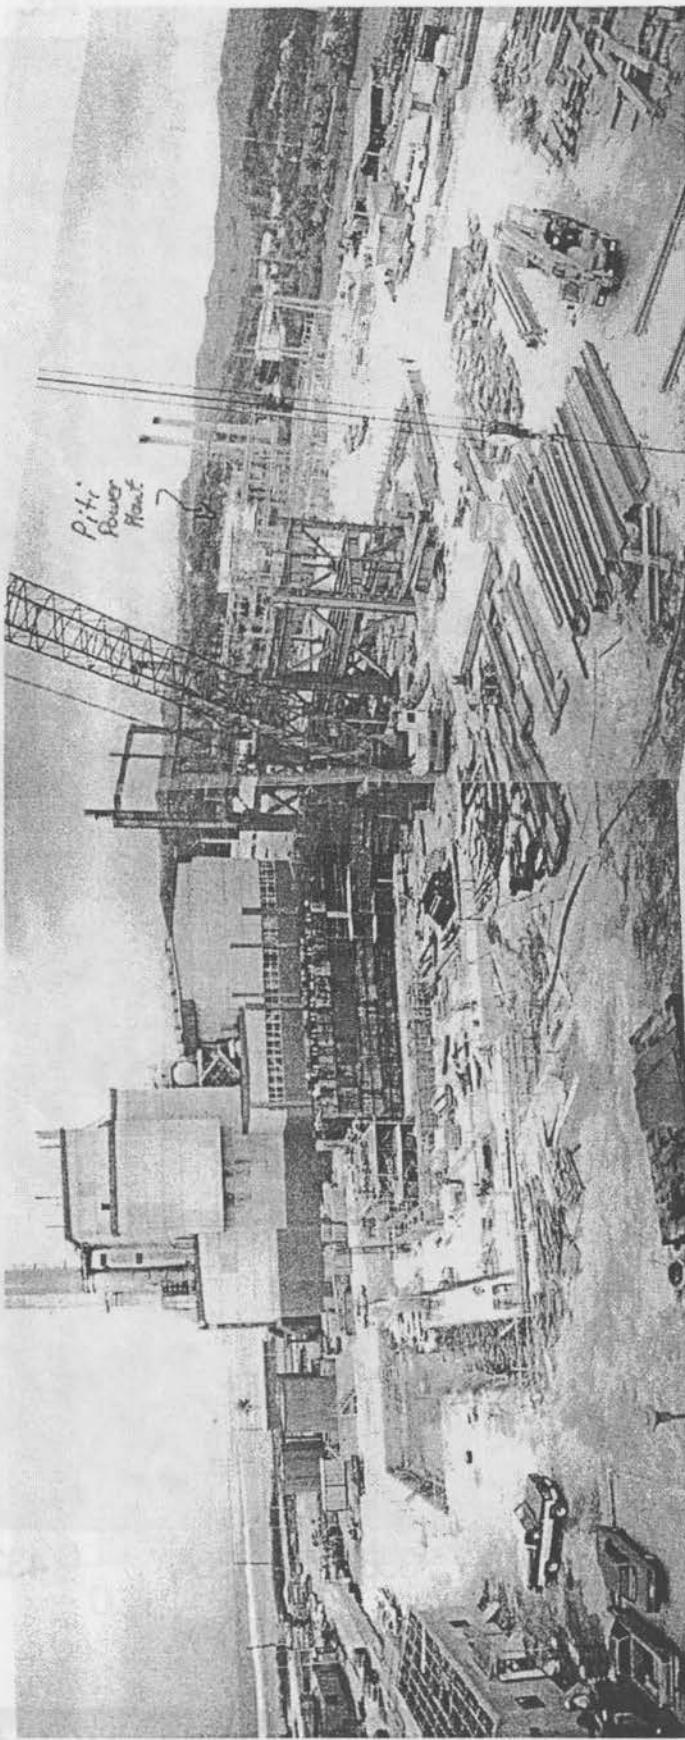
Field Site Photograph - Cabras and Piti Facilities
